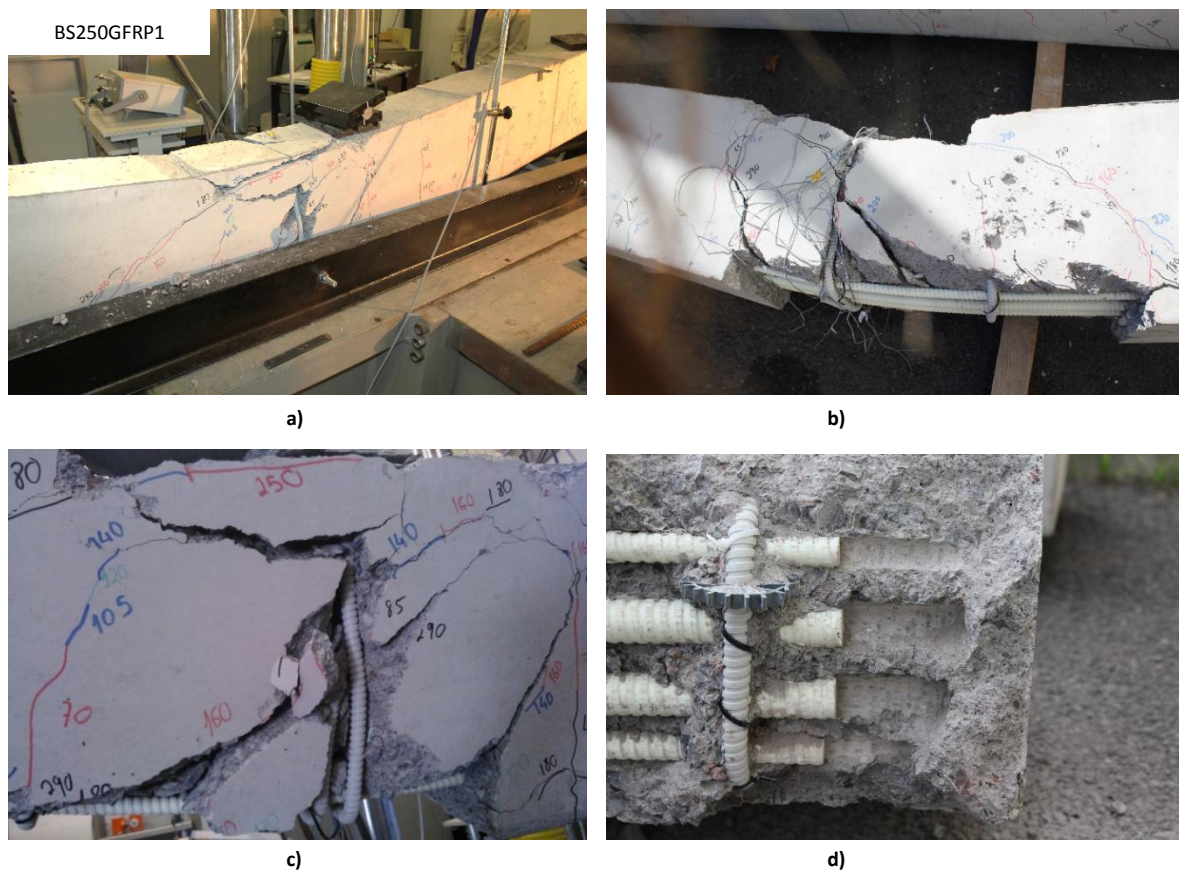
BS250GFRP1 beam failure: a) overall view; b) near the support; c) crushing of concrete under the loading point; d) slip of longitudinal reinforcement near the support
